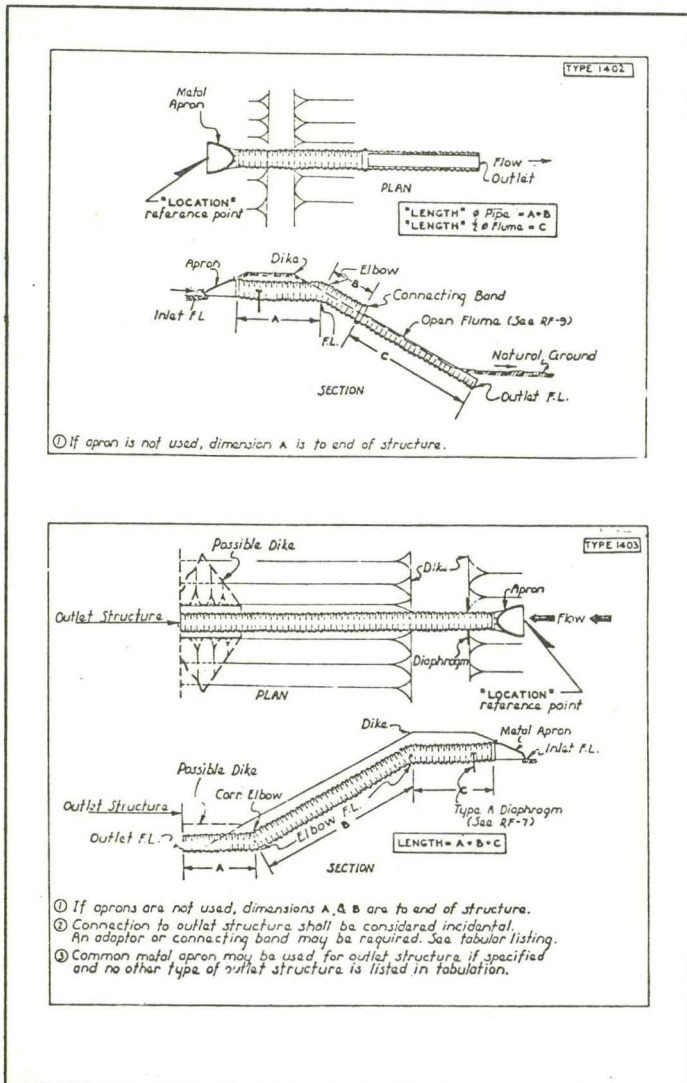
Pipe culvert standard plans 1402 and 1403.
